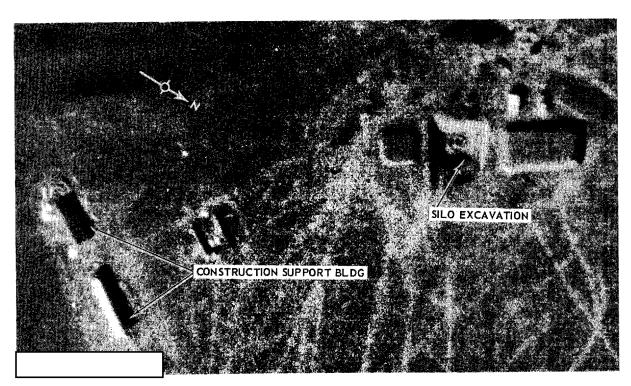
REMOVAL OF SOME CONSTRUCTION SUPPORT BUILDINGS AT DOMBAROVSKIY LAUNCH SITE 71K
